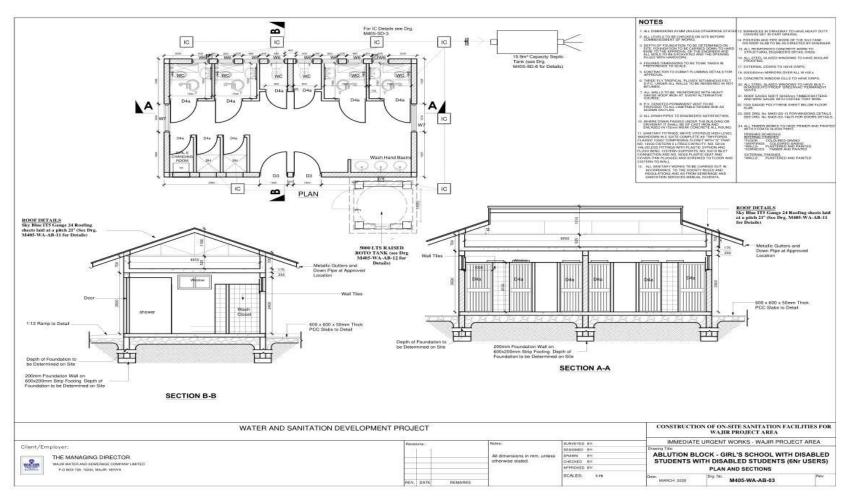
Layout plan of proposed ablution block for girls living with disability
